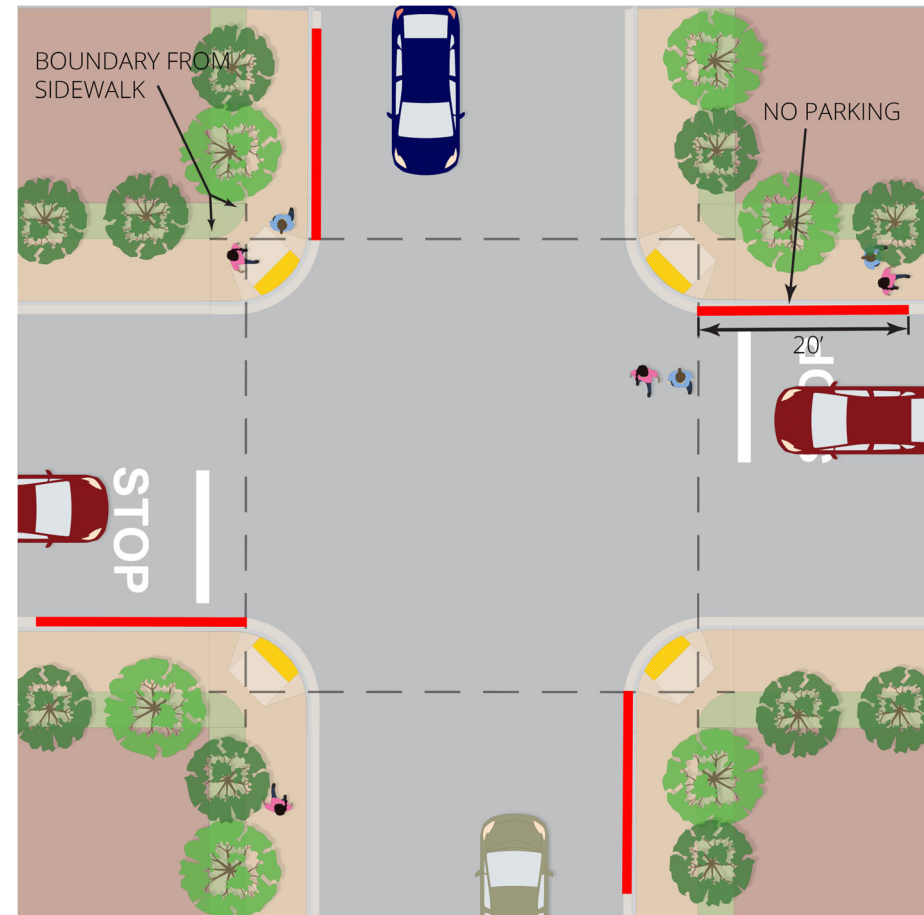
DAYLIGHTING AT A TYPICAL INTERSECTION WITH UNMARKED CROSSWALKS
